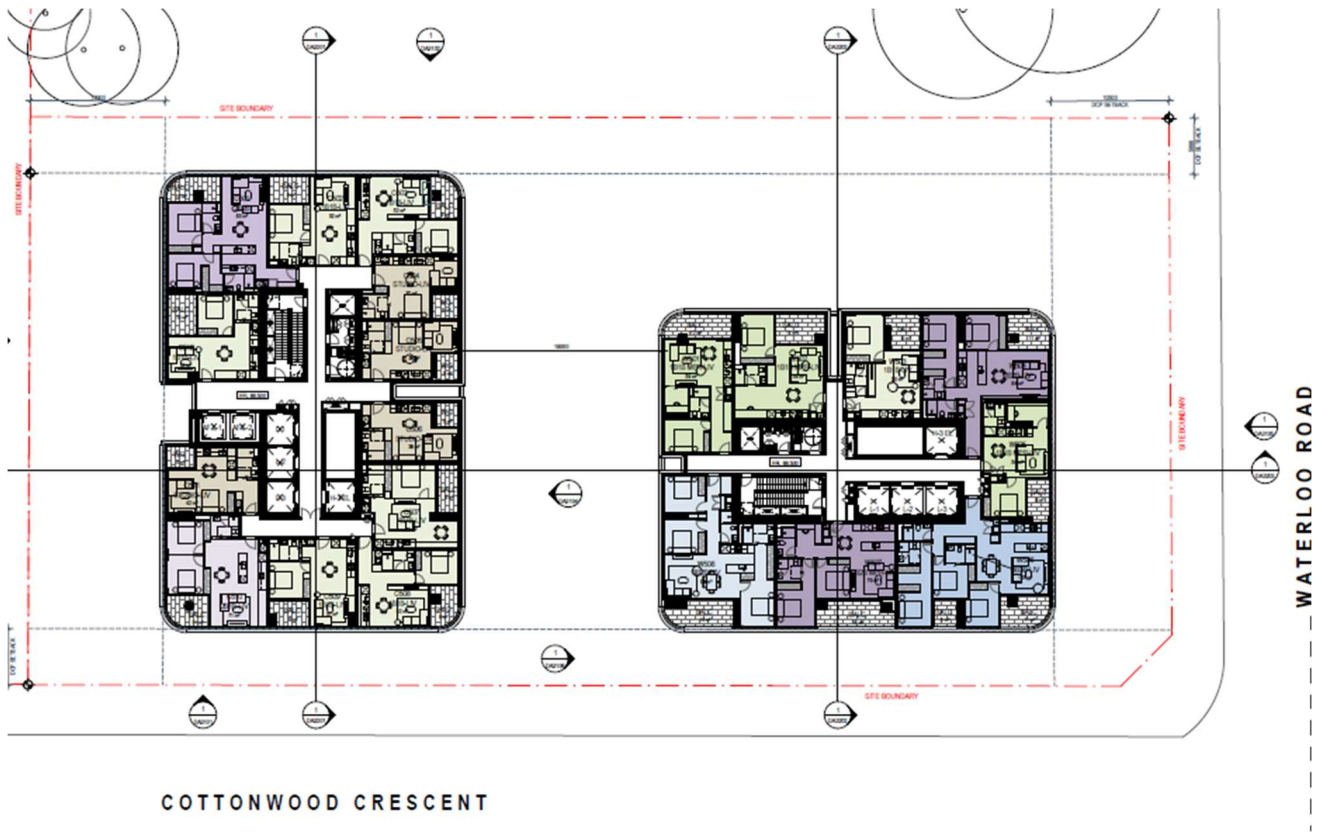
Extract of proposed plans: Level 1 (DA2009).
